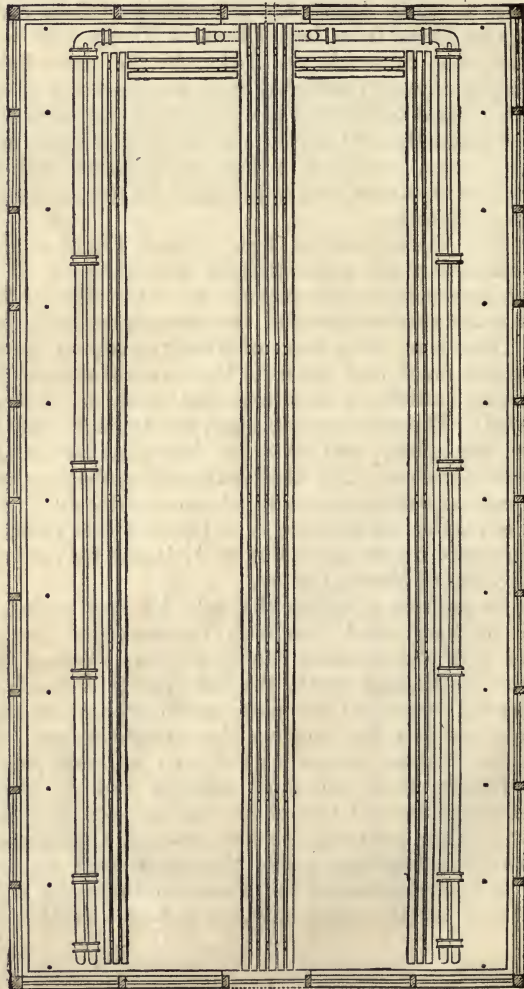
SPAN-ROOFED VINERY.—PLAN.
